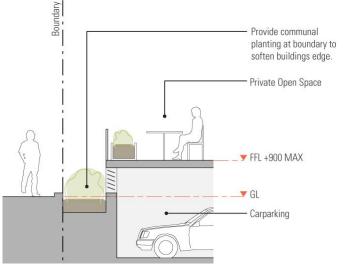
Example of landscaping used to mitigate raised building interface to street
